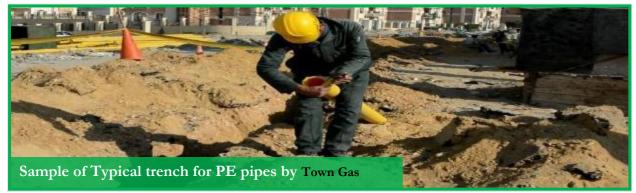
Picture showing sample of a typical trench for PE pipes by Town Gas
